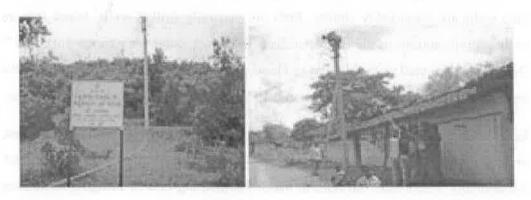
Maintenance & Repair of Electric posts and wires and Street lights at Badadarha and Rampur
